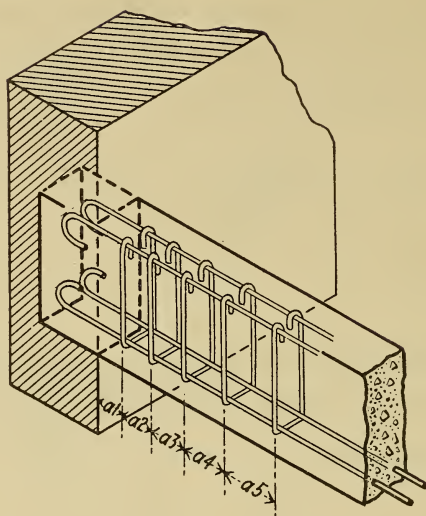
Typical Reinforced Concrete Beam with Anchored Longitudinal Bars and Vertical Stirrups.
